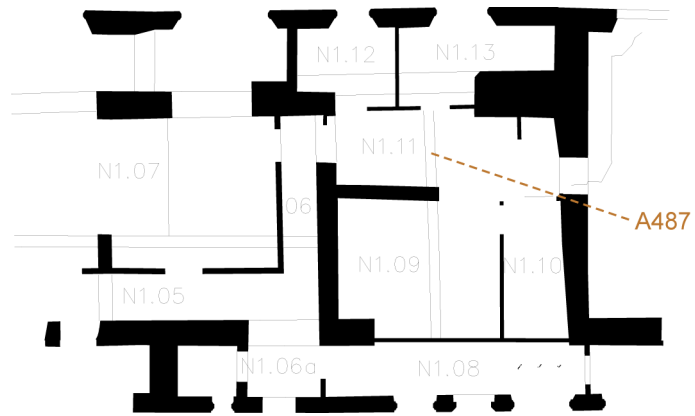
North range N1.11 and Archway roof W2.01, showing location of sample APT-A487
